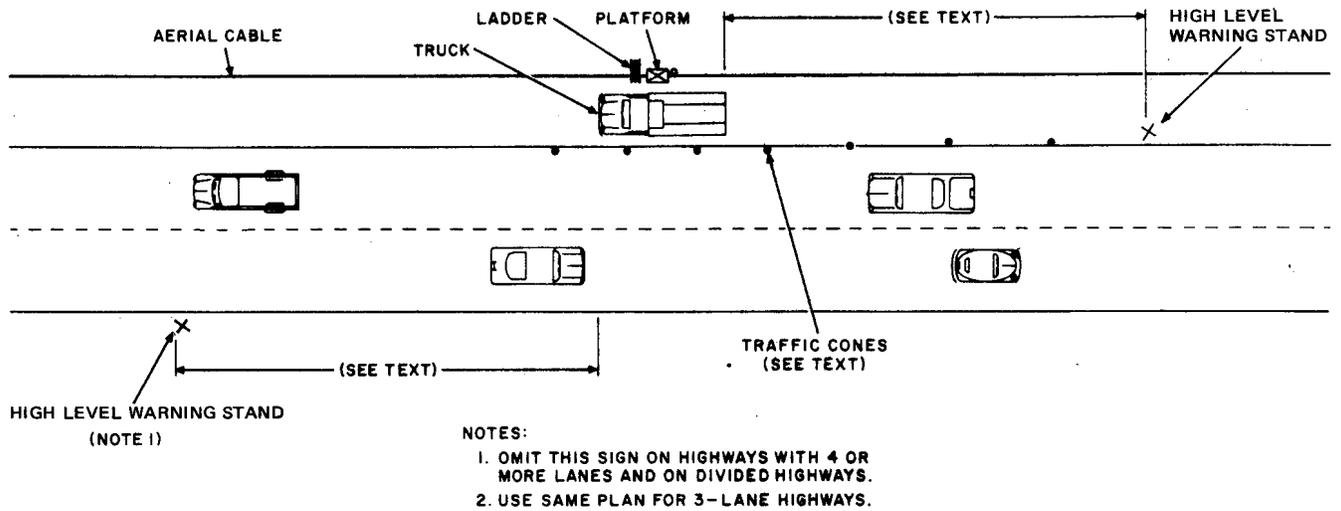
Placement of Warning Devices on Street or Highway - Aerial Plant on Shoulder
